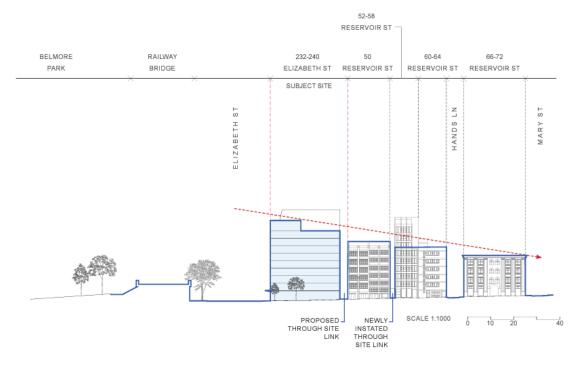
Proposed building envelope – viewed from Reservoir Street facing west
